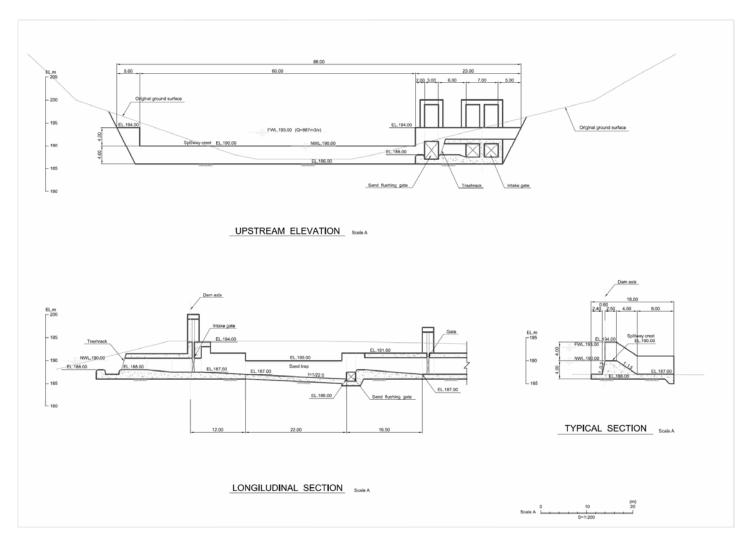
Elevation and Sections of No.1 Intake Weir
